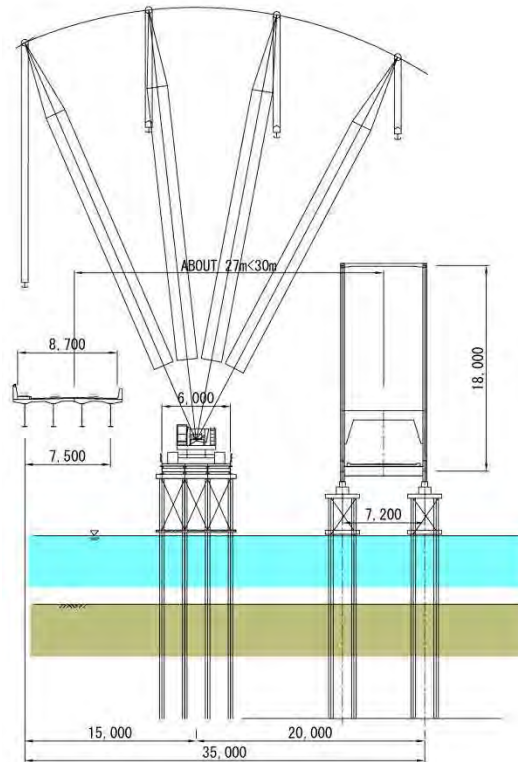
Explanatory Drawing of Distance between New Bridge and Existing Bridge
